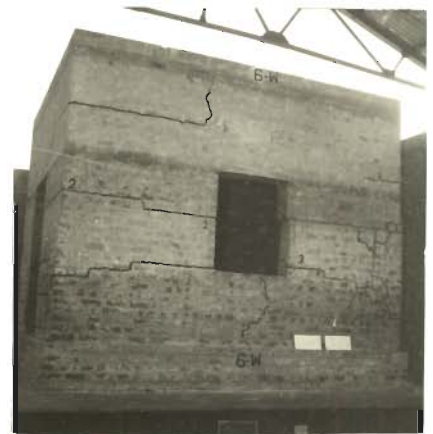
\_ WEST CROSS-WALL BADLY DAMAGED, ITS RIGHT PIER BROKEN INTO TWO PARTS (MODEL 6)
